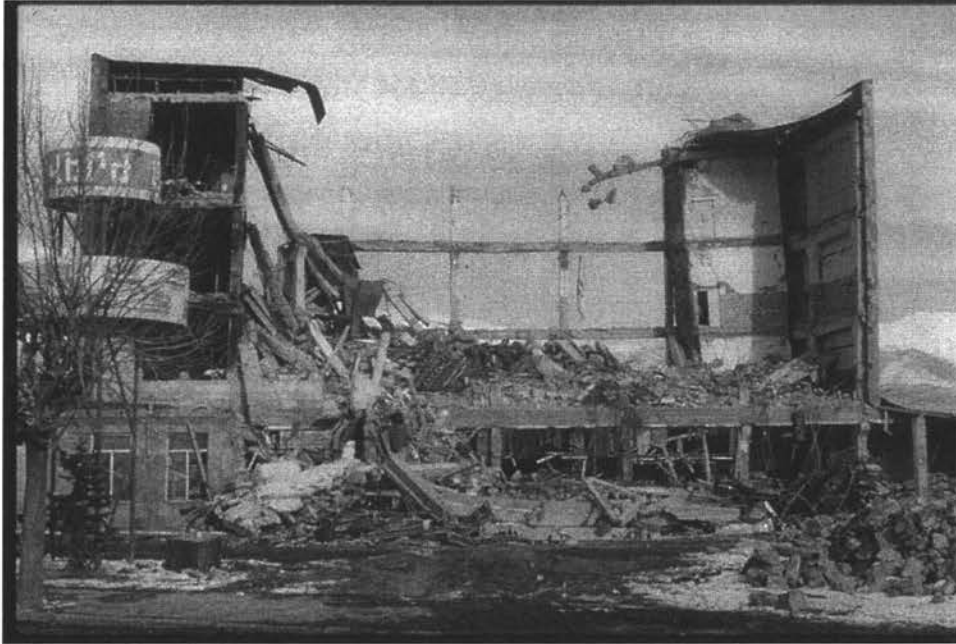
Collapse of floor panels, leaving cast-in-place walls standing in a building in Leninakan [12].
